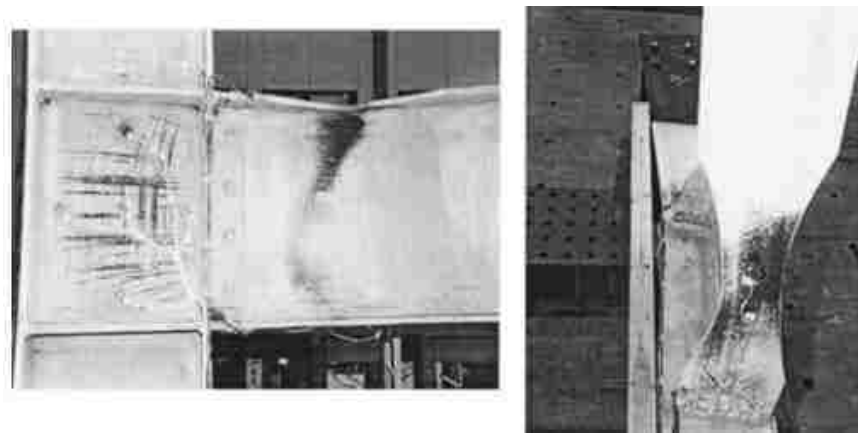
Yielding and Twisting of a Deep Column with Reduced Beam Section Connection (Chi and Uang 2002)
